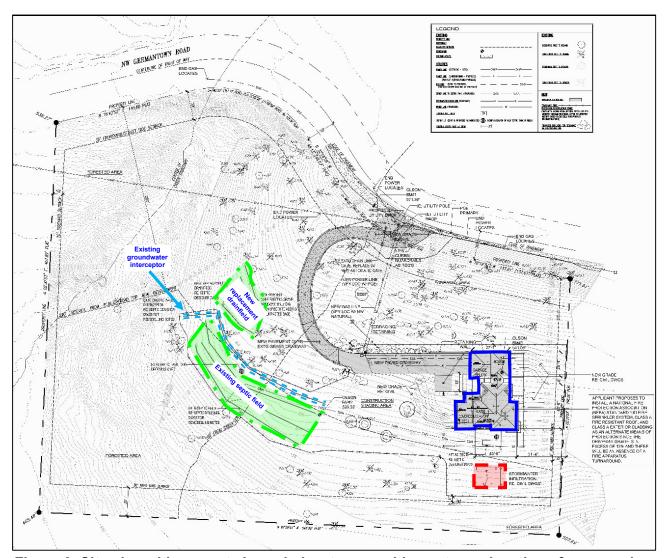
Site plan with property boundaries, topographic contours, location of proposed home footprint (outlined in solid blue), stormwater infiltration area currently planned (outlined in red-dash lines), existing groundwater interceptor line (outlined in light bluedot double lines), and septic drainfield areas currently planned (outlined in green-dash dot lines) (base drawing source: Site Plan, A1.0, by Karina E. Adams Architect, dated November 10, 2021).
